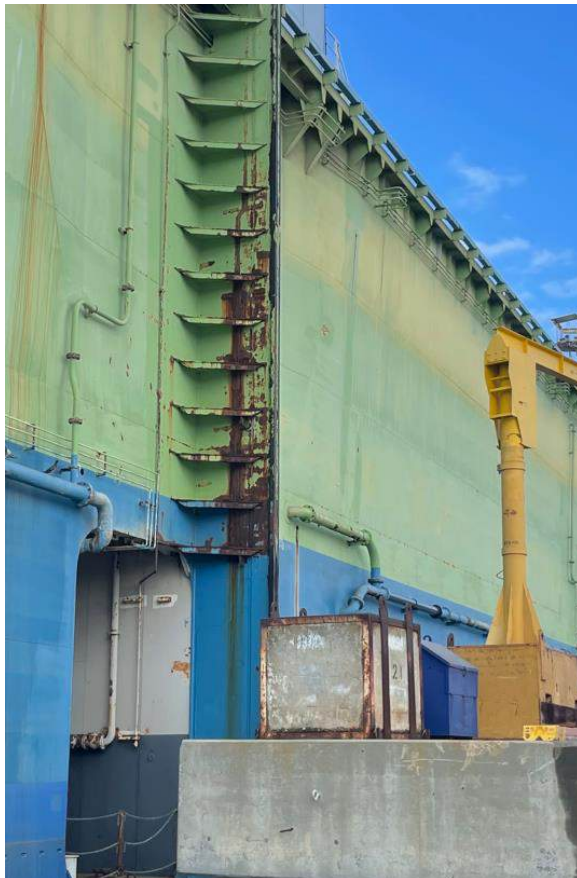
Condition of Frame 121 90 deg. Mooring Tee
